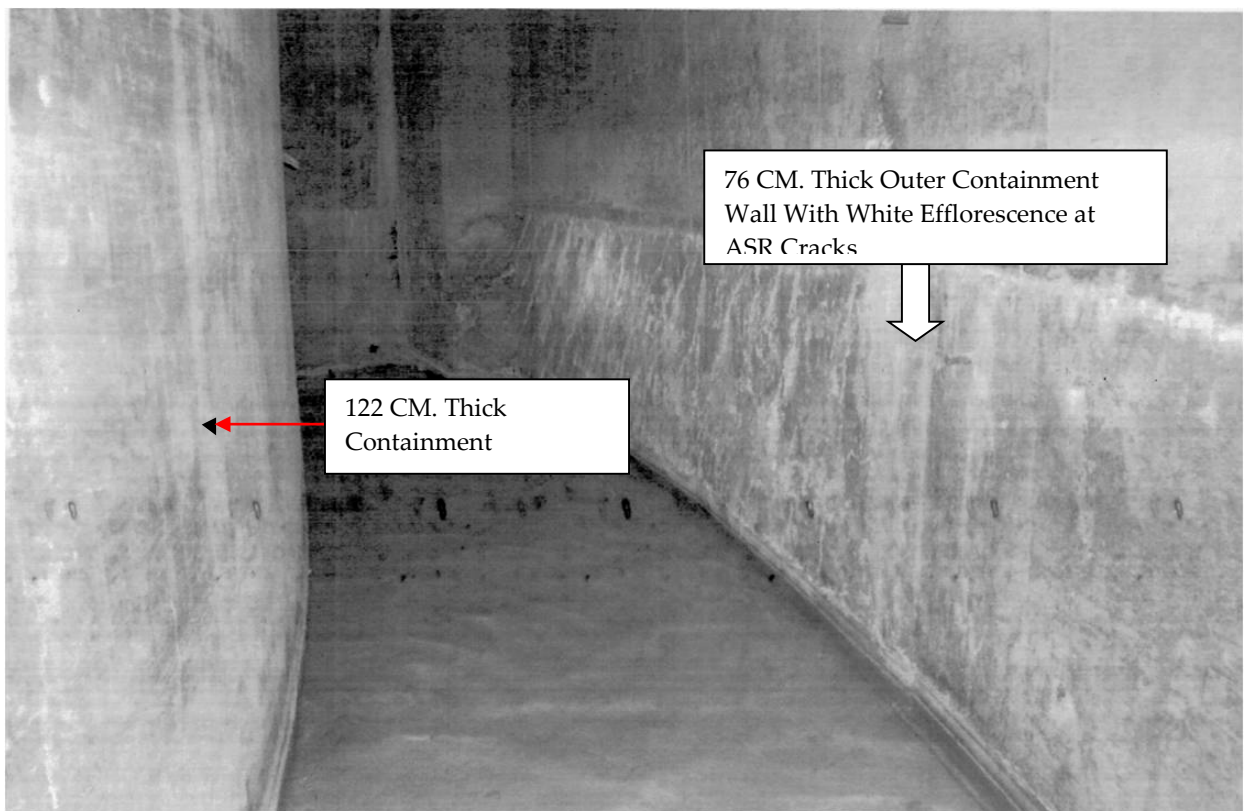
Alkali Silica Reaction in Outer Containment Wall
